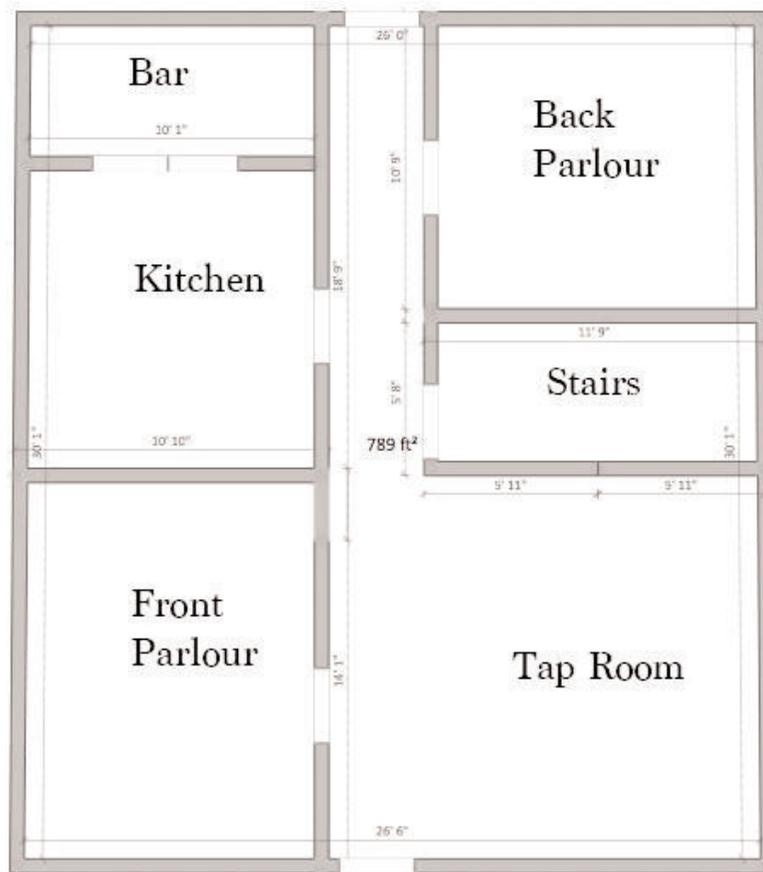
Reconstructed plan of the ground floor of The Crown. Author's Own.
